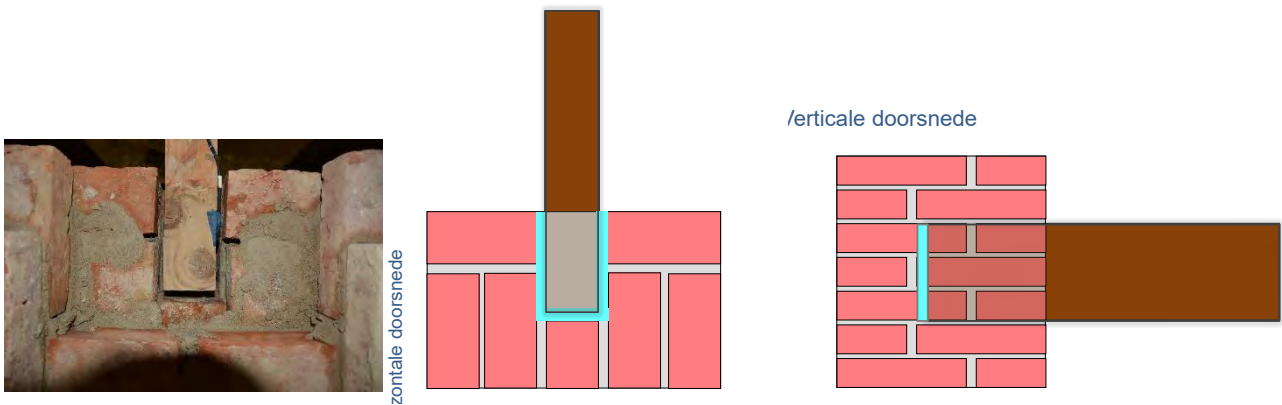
Left: top view of the wooden beam end embedded in the masonry. Right: schematic indication of the air gap (light blue) around the wooden beam end (left drawing: top view, right drawing side view).
